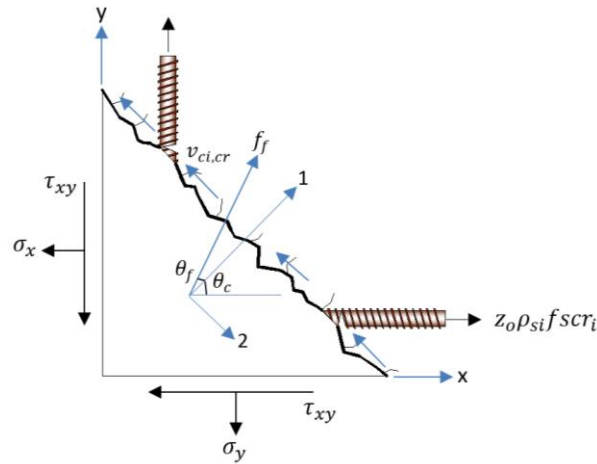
Equilibrium conditions along crack surface after reinforcement crack propagation.
